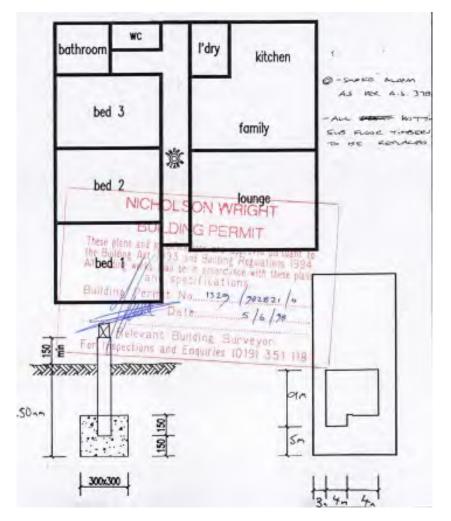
Floor plan of 112 Wedge Street, 1998 Source: Building Permit 56250, provided by Wyndham City Council
